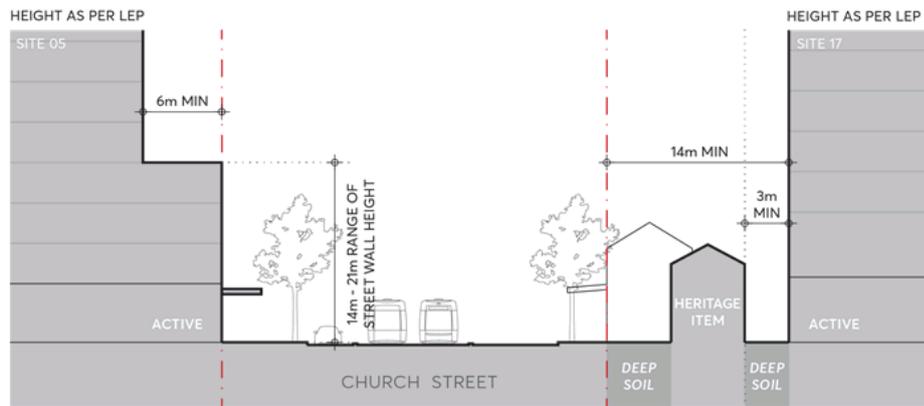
Site 17 (Section J) Setbacks and Street Wall Height
